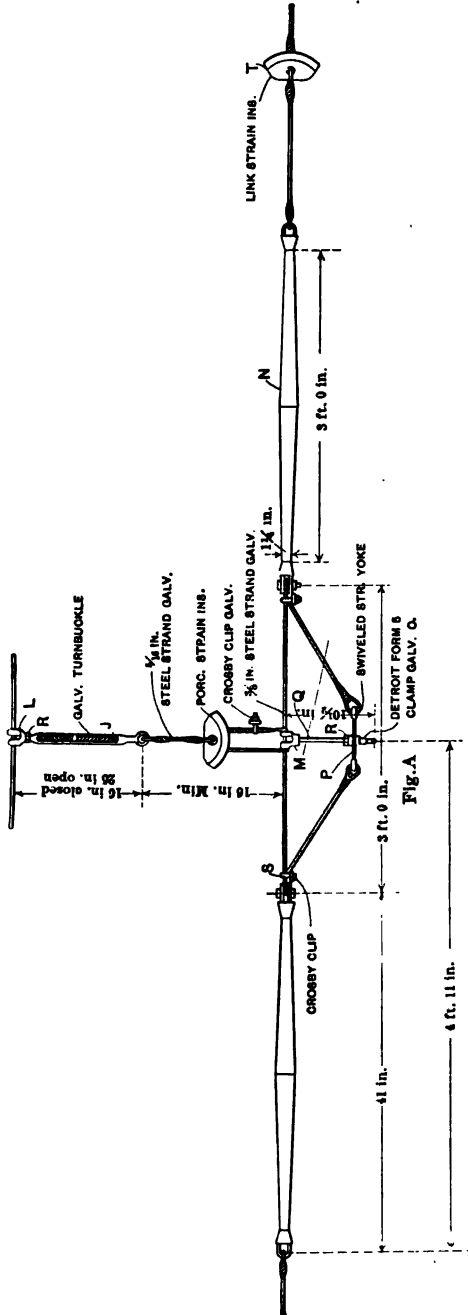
Detail A of Fig. 17 showing method of holding trolley wire.
